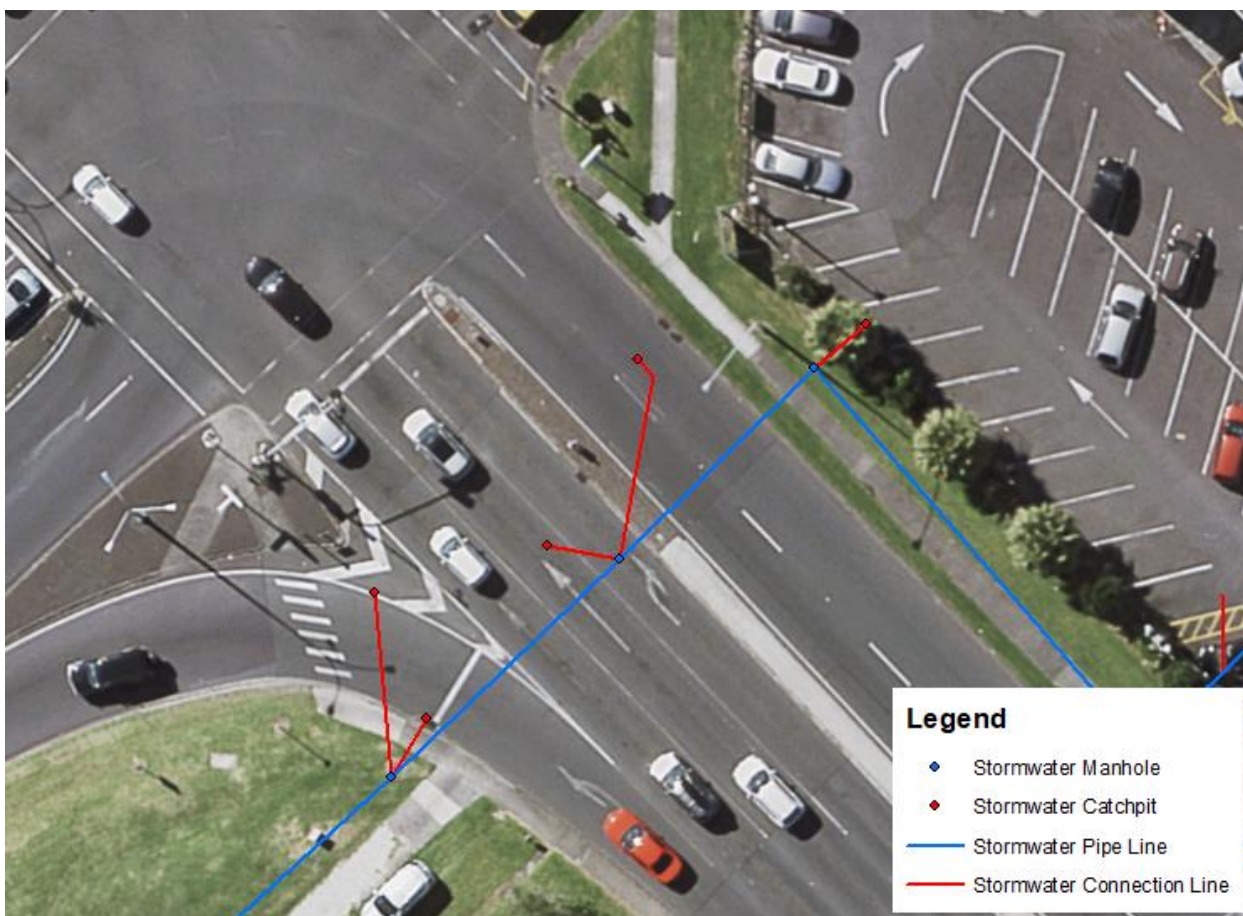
Example of existing stormwater network from Auckland Council GeoMaps near the Ti Rakau Drive - Reeves Road intersection. In less detailed models, only the manholes and pipes shown in blue would be modelled. In the detailed model, the catchpits shown in red were included.
